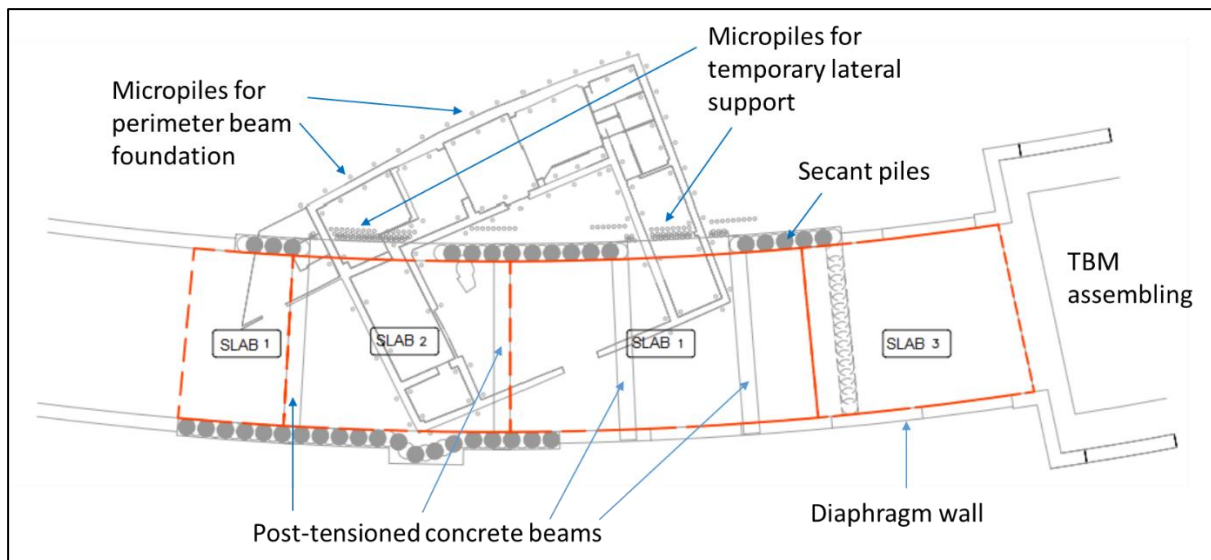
Plan view of the tunnel and the building, indicating the construction elements involved.
